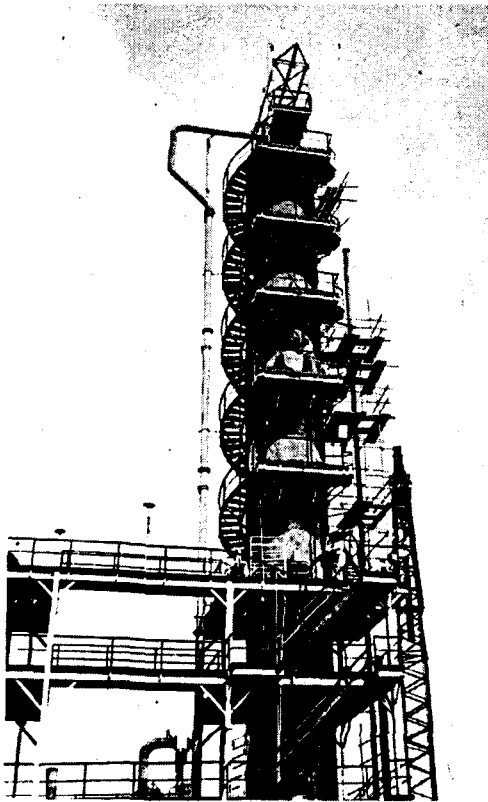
(left). Tray removal and replacement were done in the top half of this 150-ft tower; both torch cutting and welding were studied at different levels. Fig. 2 (above). A high degree of confinement was encountered during welding of a nozzle in this 190 cu ft reflux drum.
